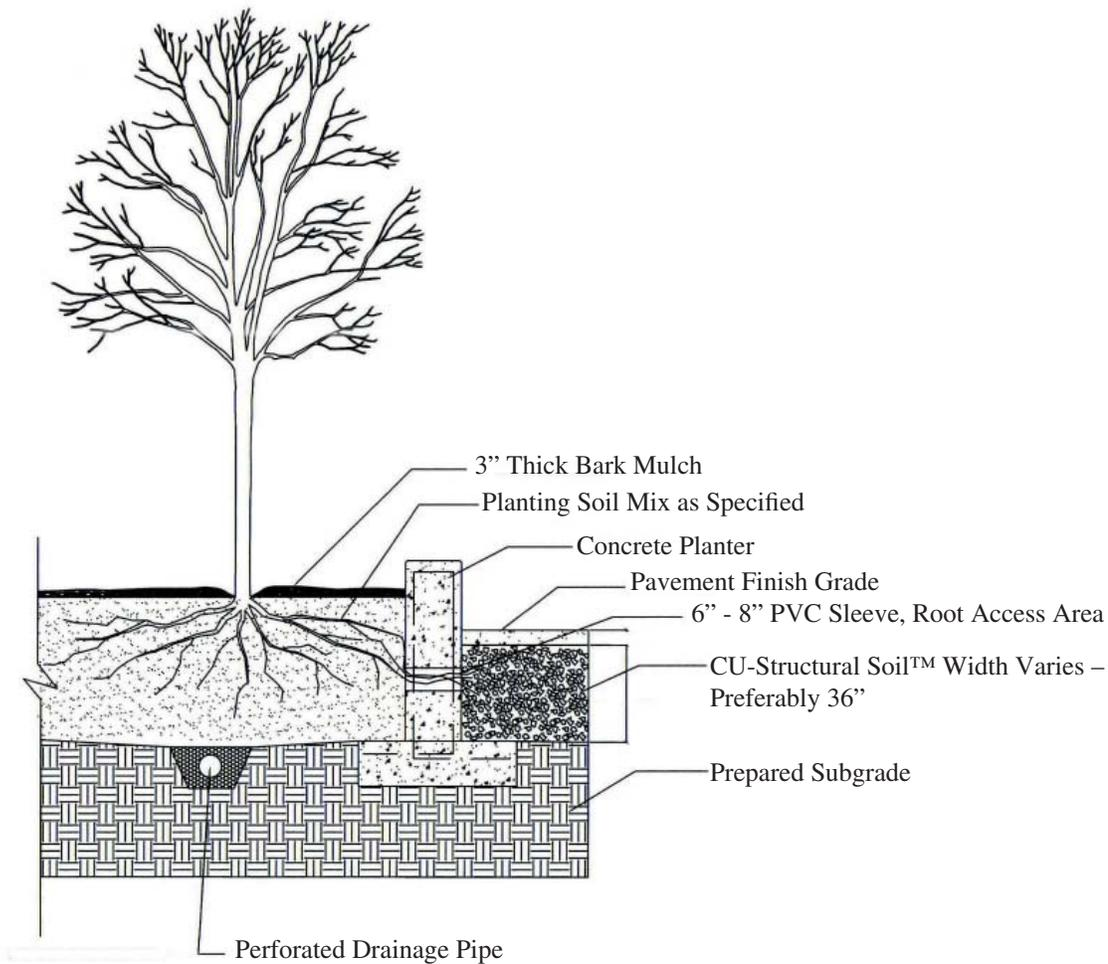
Limited soil volume planter with root access into CU-Structural Soil™ under plaza pavement
